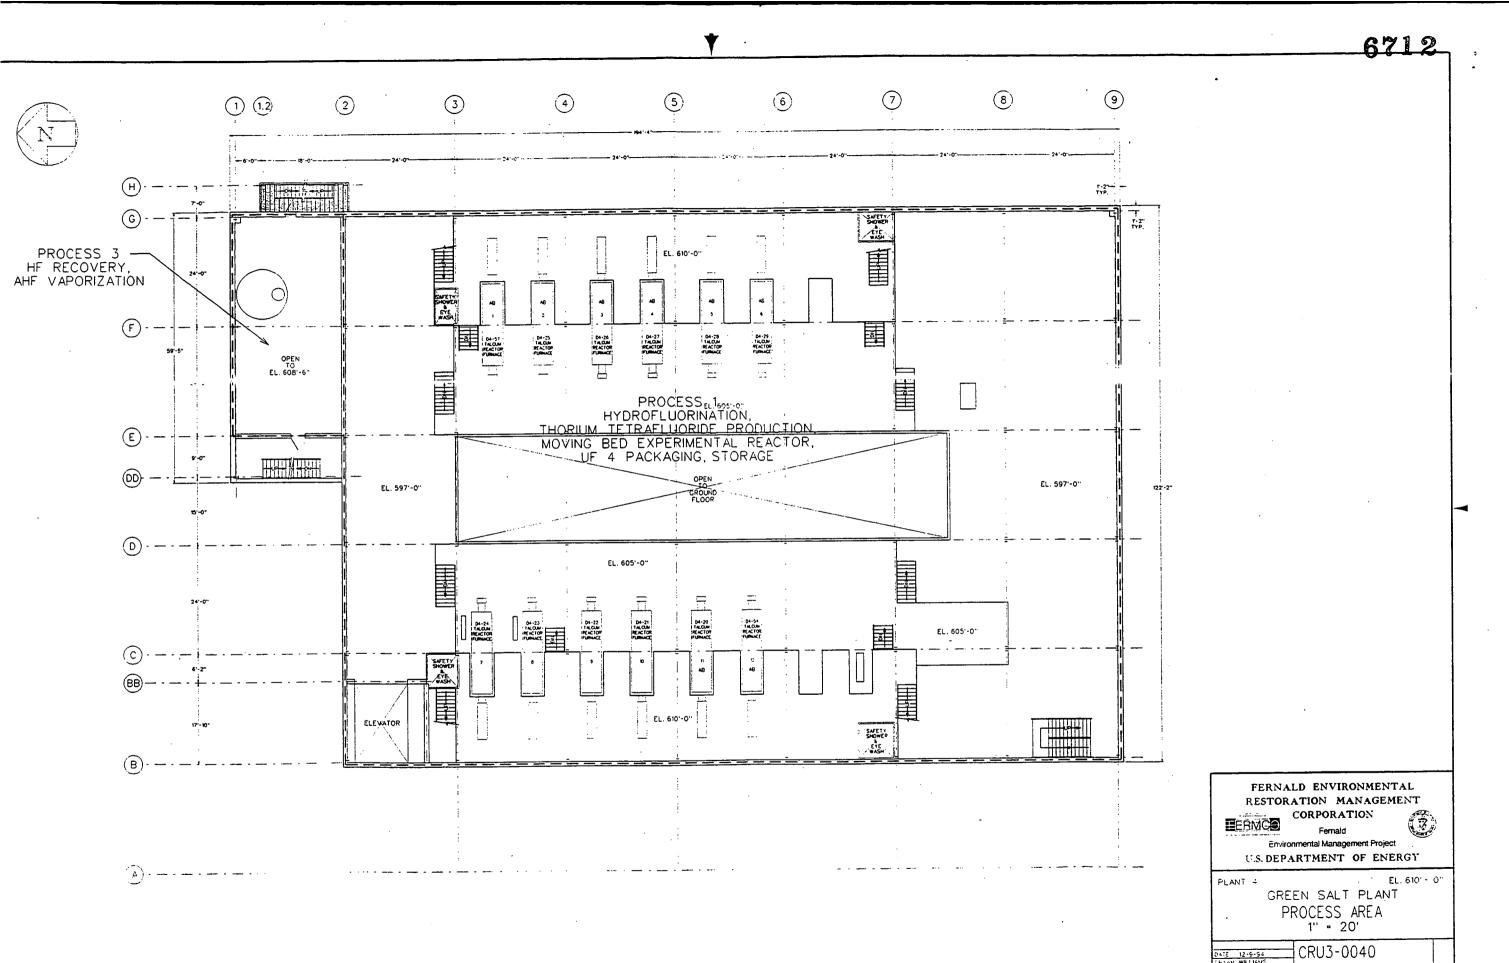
Floor Plan of Building 4A - Third Level (ELEV. 597'-0")
